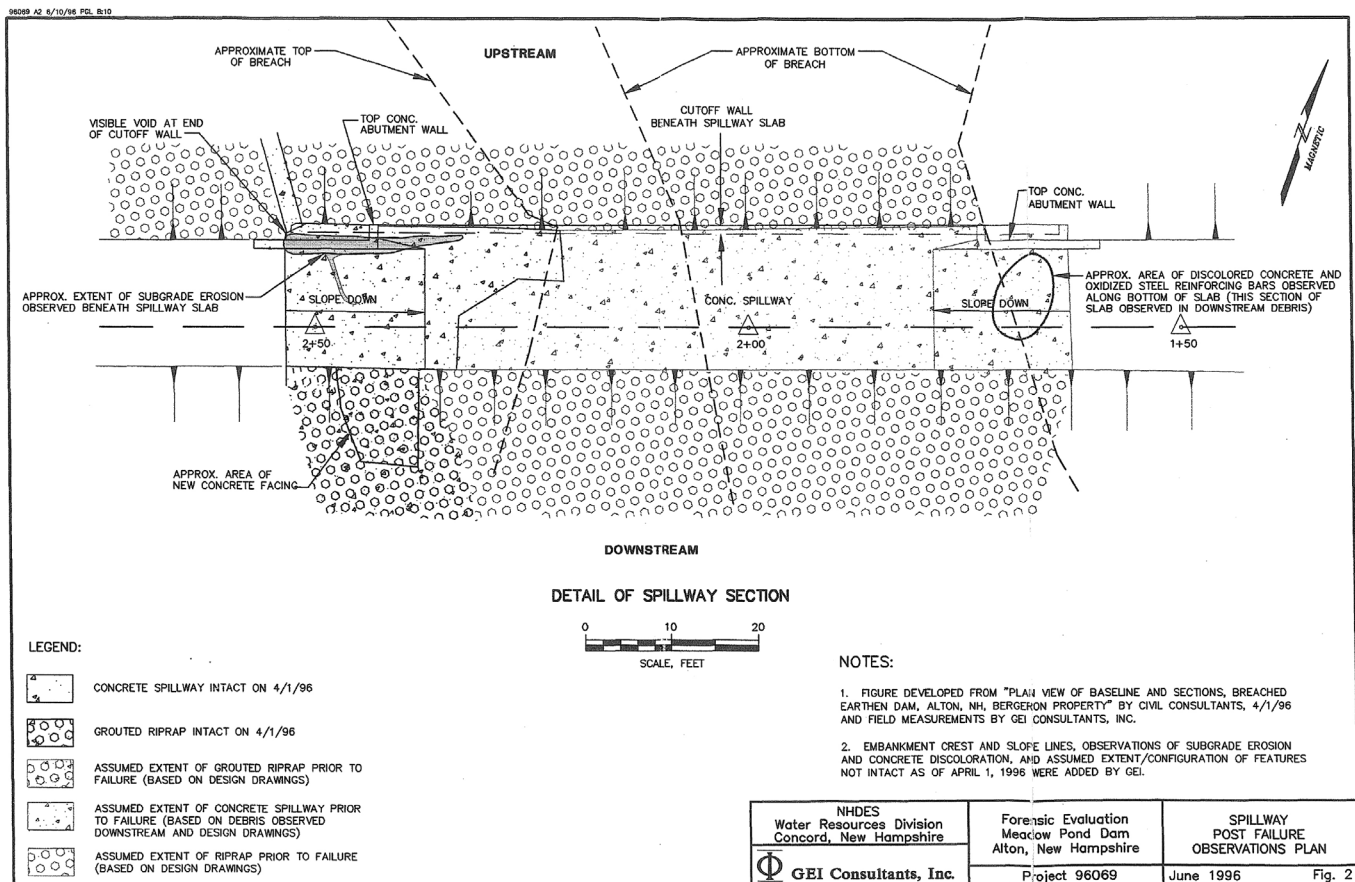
Spillway Post Failure Observations Plan (GEI Consultants, Inc.)
